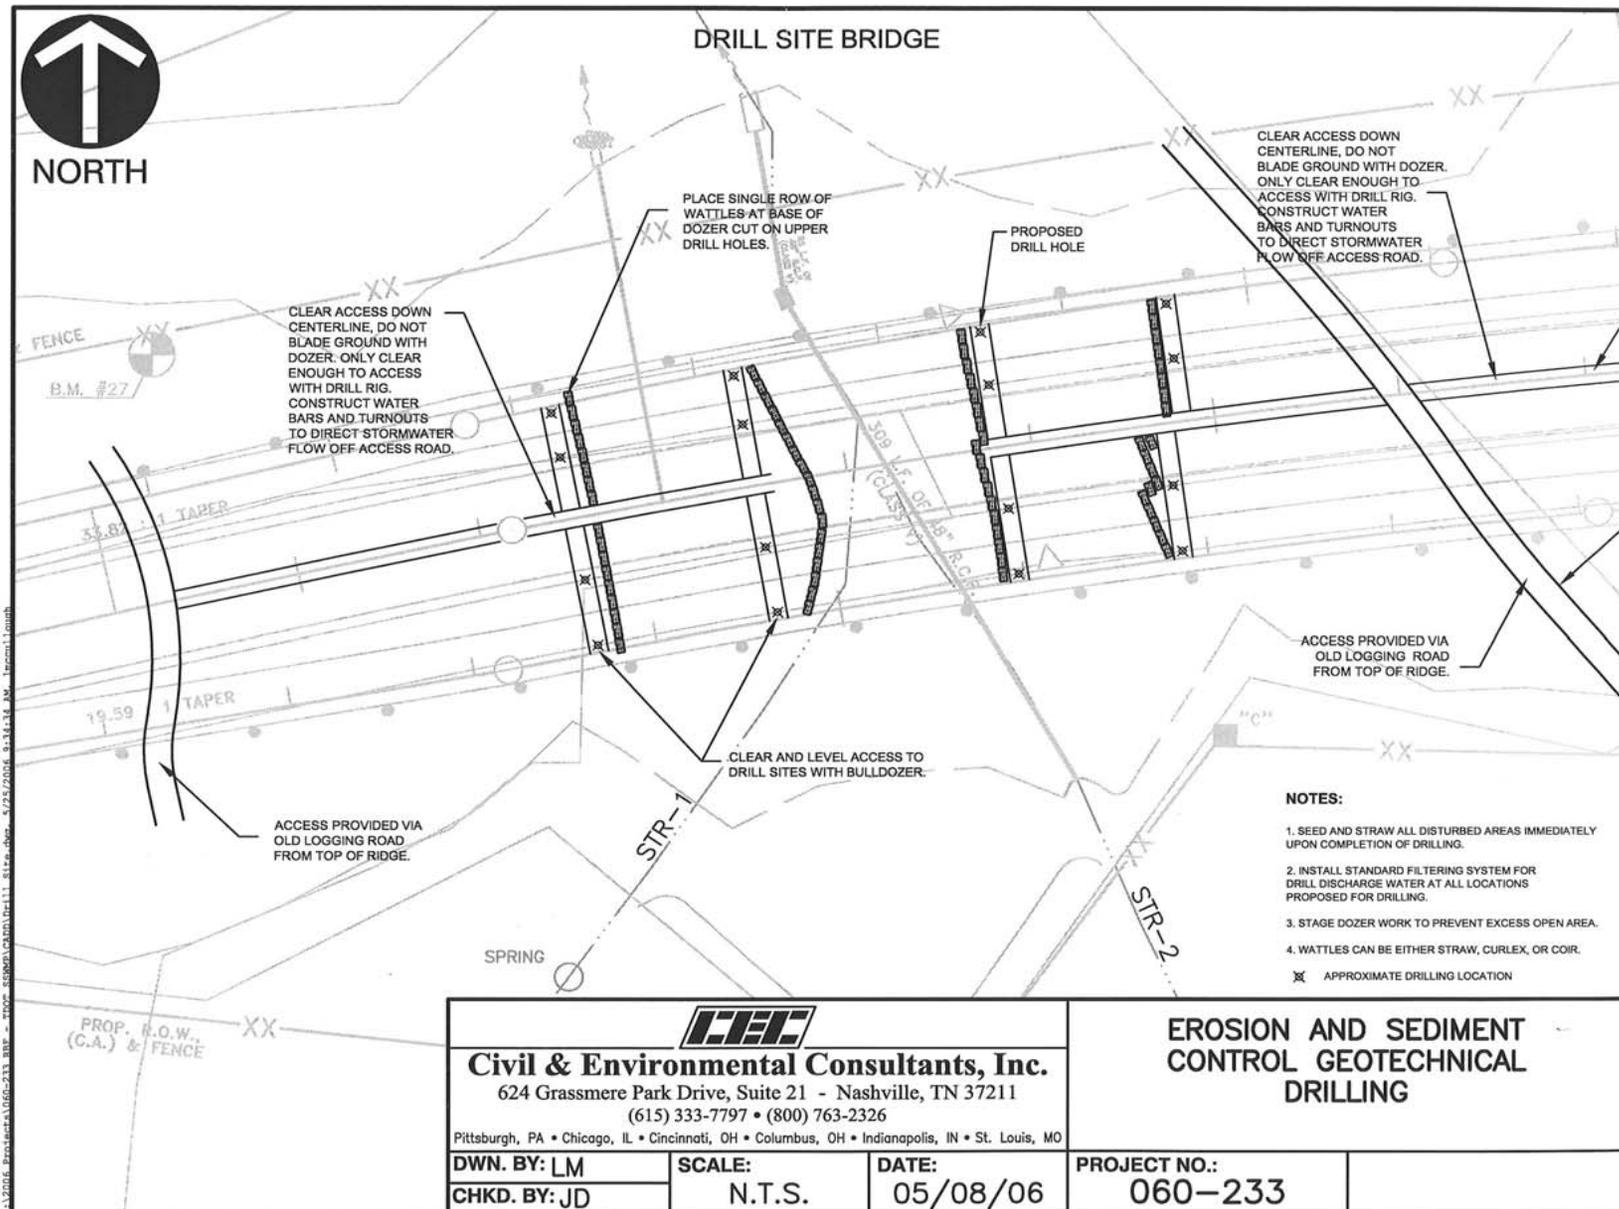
Geotechnical Drill Setup for Drilling Adjacent to Streams
